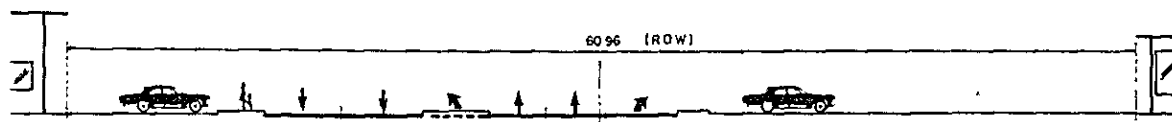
EXISTING CROSS SECTION OF VIA BOLIVAR
